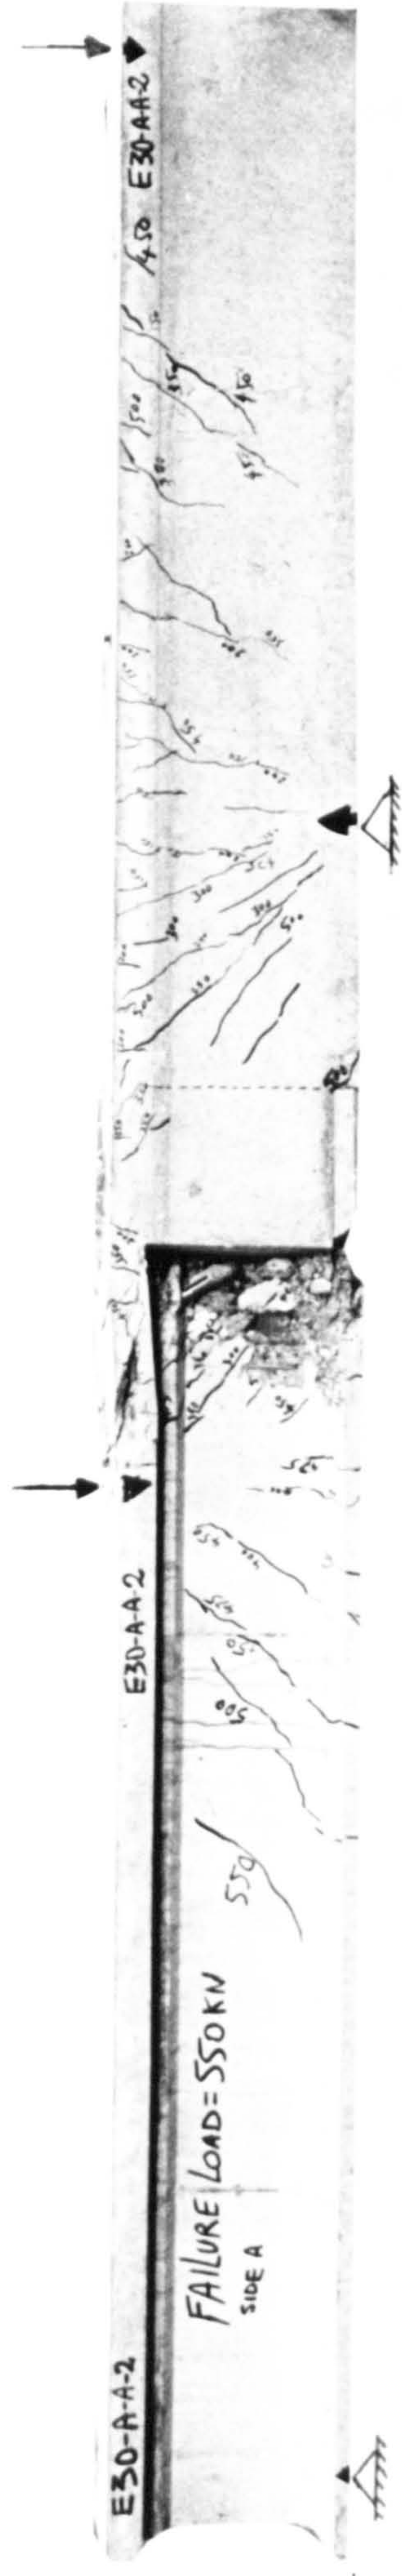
Longitudinal Elevation of Beam E30AA2 After Failure
